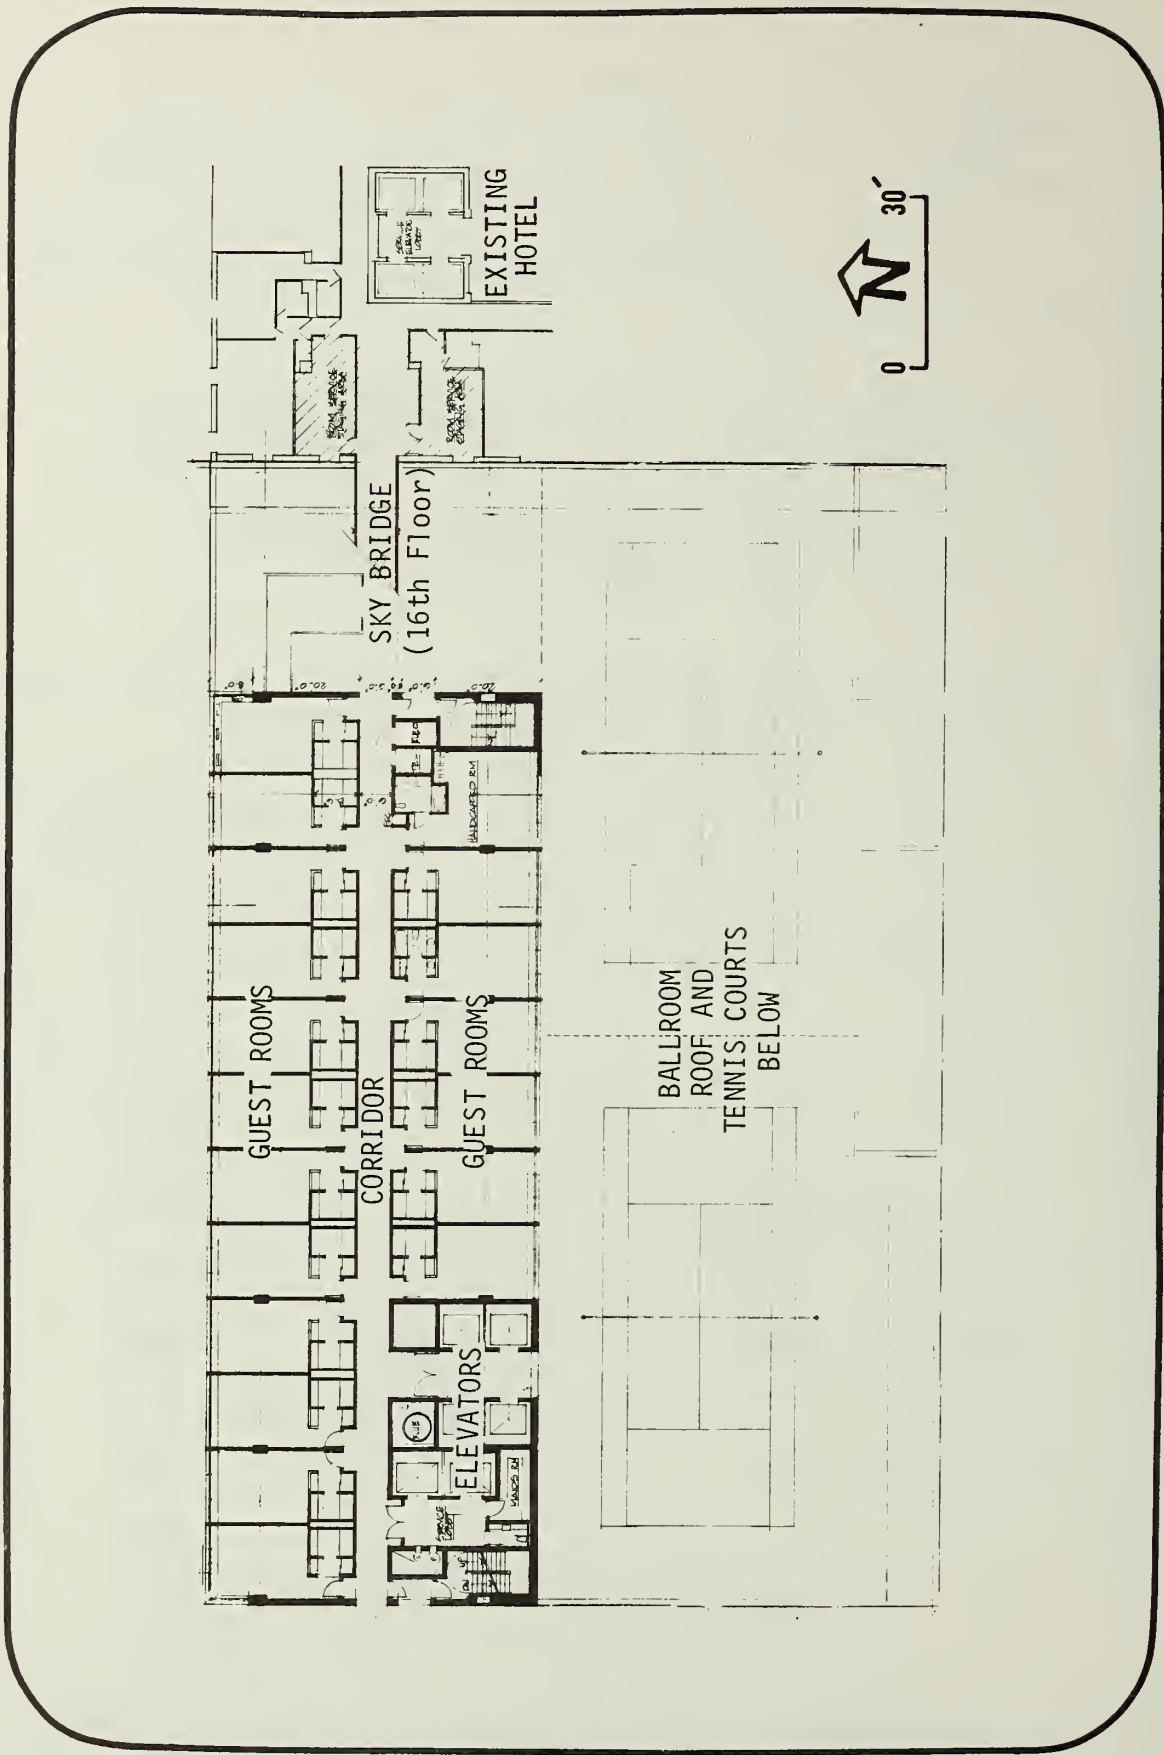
TYPICAL GUEST-ROOM FLOOR PLAN
